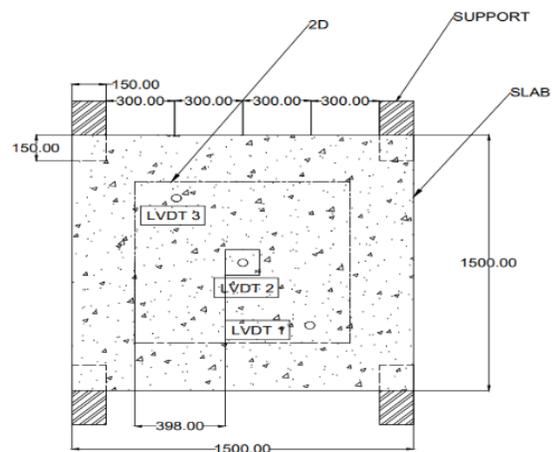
The arrangement of LVDT devices for the slab specimen
